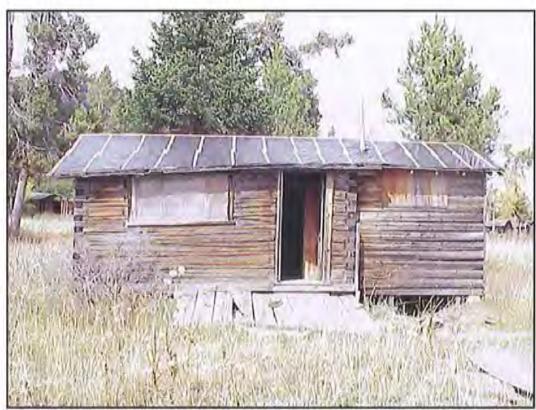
South wall of HS-1155, Cabin 15; bathroom addition to right. Source: A&E Architects, 2004.
